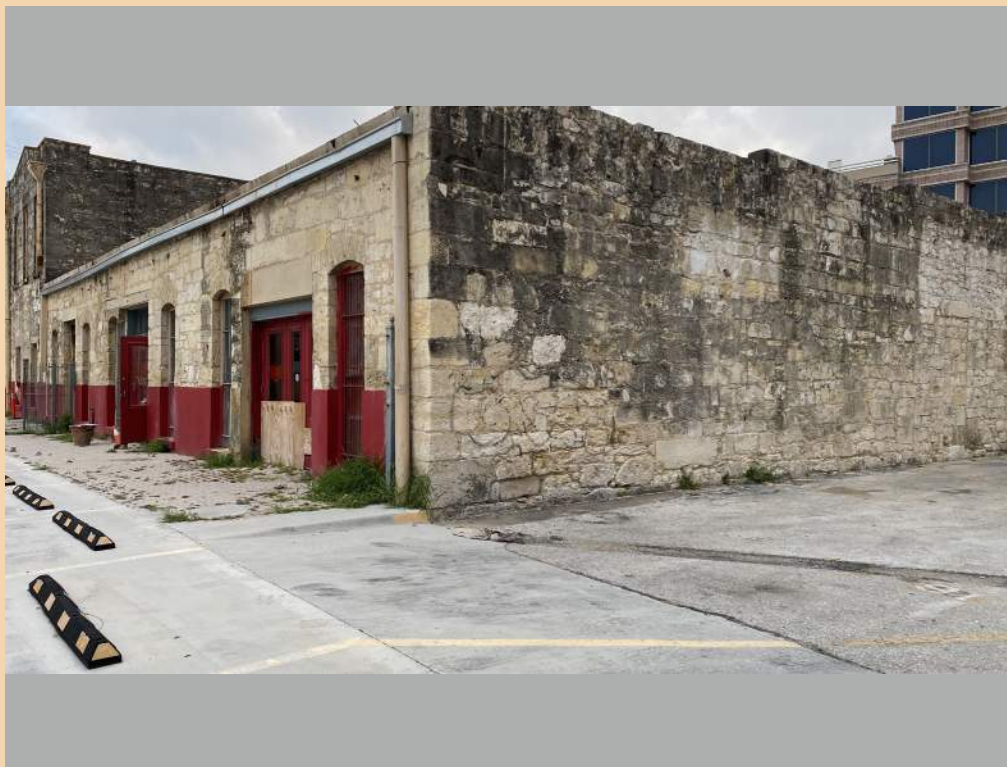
Building at 210-214 S Flores, North & East Elevations. Camera Facing Southwest. 12/2021
